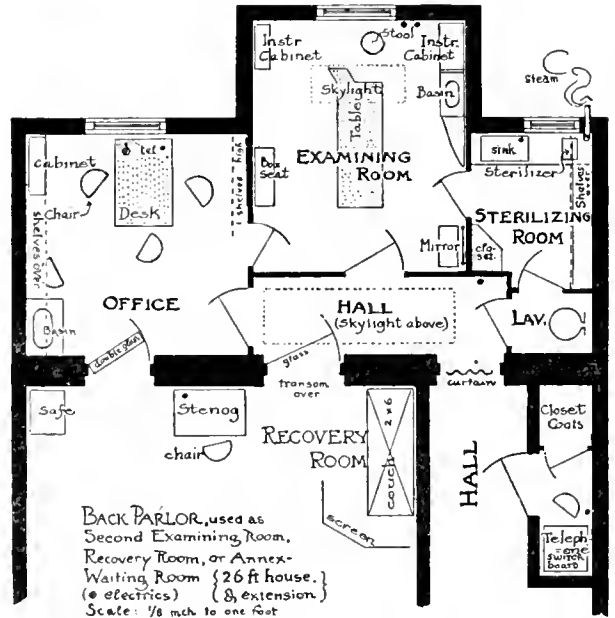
Extension on 20-ft. house, being an alteration of an old 11-ft. extension. With this arrangement one patient can be dressing, another undressing, while a third is in the desk office. All rooms and lavatory open into hallway. The success of this office and the many comments on it led to the writing of the article. In bitter weather the plumbing is cut off at night by cocks in the coat closet. All the cuts on the opposing pages are placed for convenience of comparison. The plan looks crowded, but this is owing largely to the extensive labelling. The water-closet (Lav.) should be enlarged somewhat at the expense of the sterilizing room. The overhead shelving does not trench on floor space, as might appear from the plan. The skylights give fine effects for photography. They have double sash in winter. Such an extension needs its own separate furnace unless neighboring houses project quite as far and a laundry runs beneath. The extension roof should be lower than ceiling of back parlor to allow lighting this dark room through transoms or low windows.
